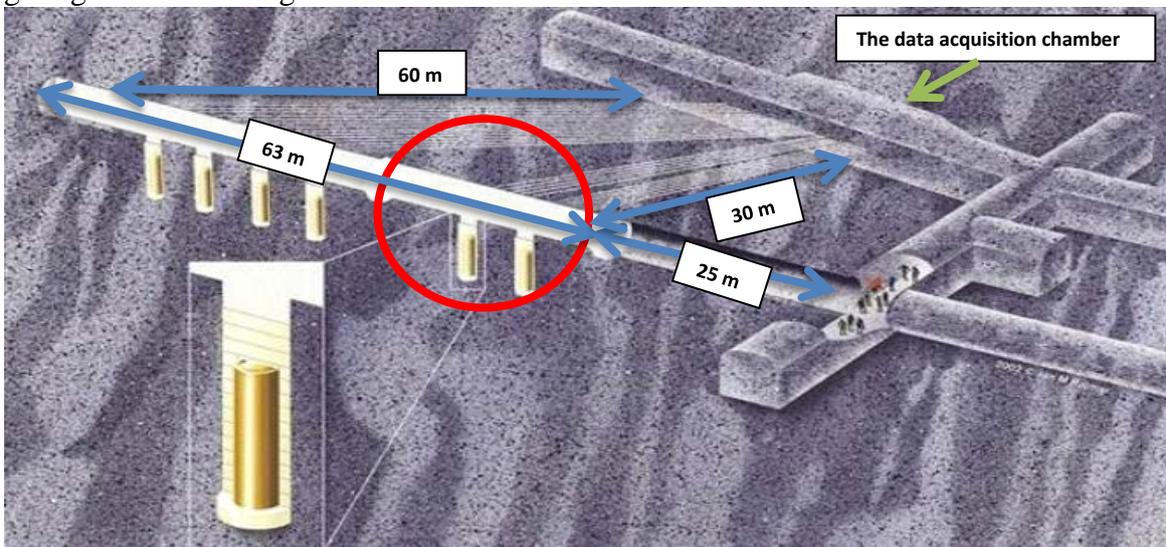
Schematic view of the layout of the Prototype Repository (the outer section II marked red).
